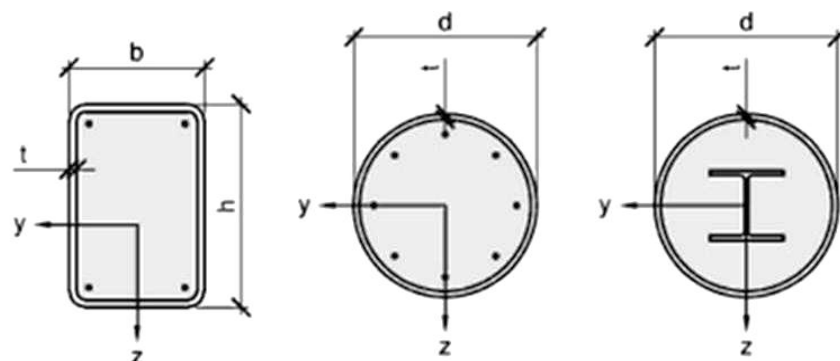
Typical Cross-Section of Composite Columns with Fully or Partially Concrete-Filled Hollow Sections
